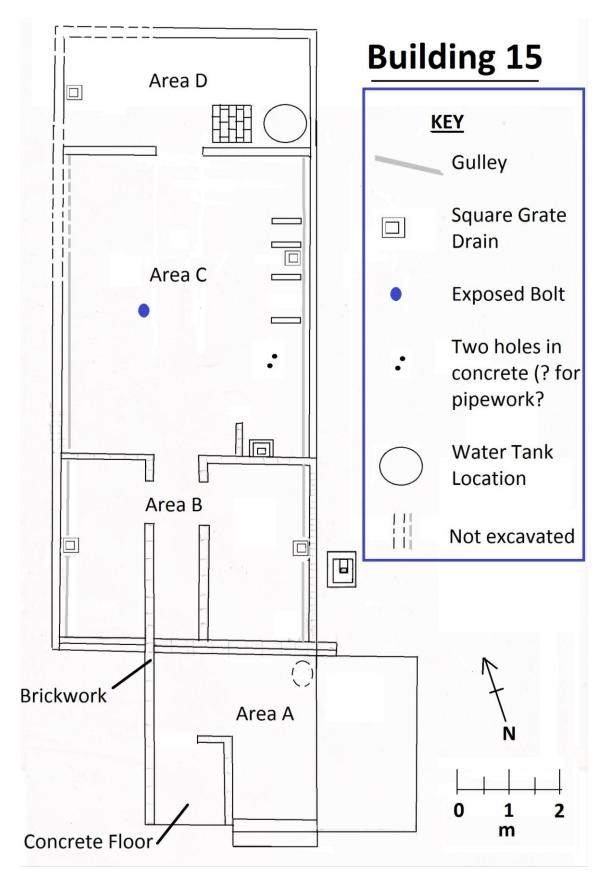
Annotated plan of Building 15 following excavation and surveying.
